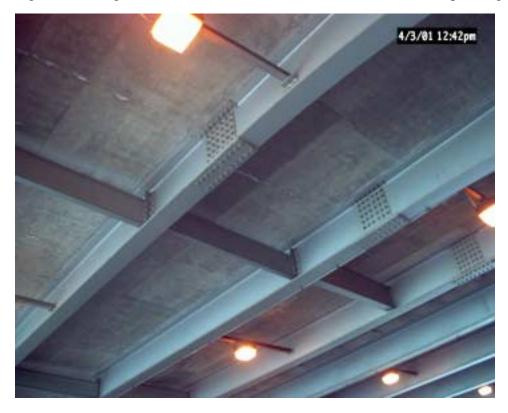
Girders at Caldwell Street Bridge, between 1st and Brook before painting.
